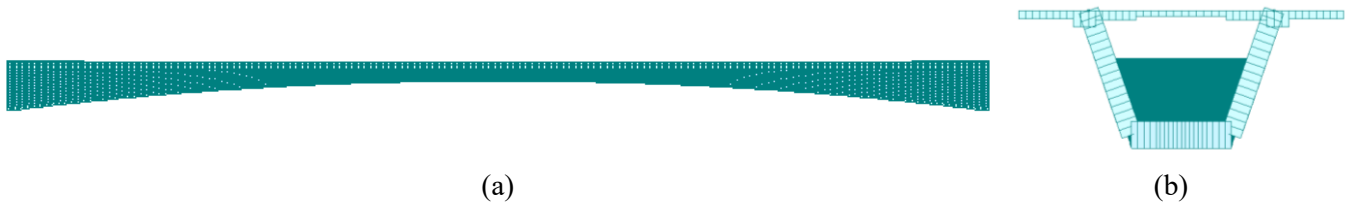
Modeling of The Box Girder Bridge, (a) Long Section; (b) Cross Section.
